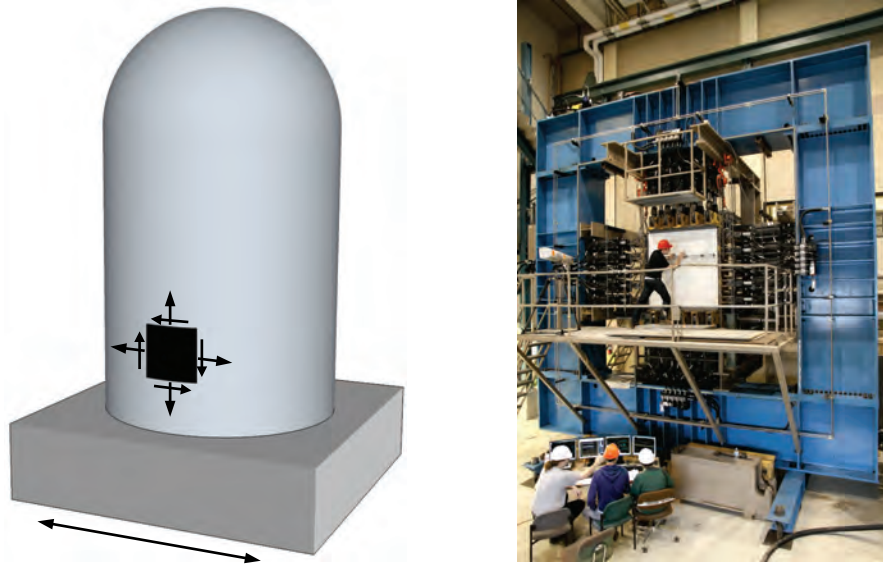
NPP wall element subjected to shear (left) and Shell Element Tester (right).
